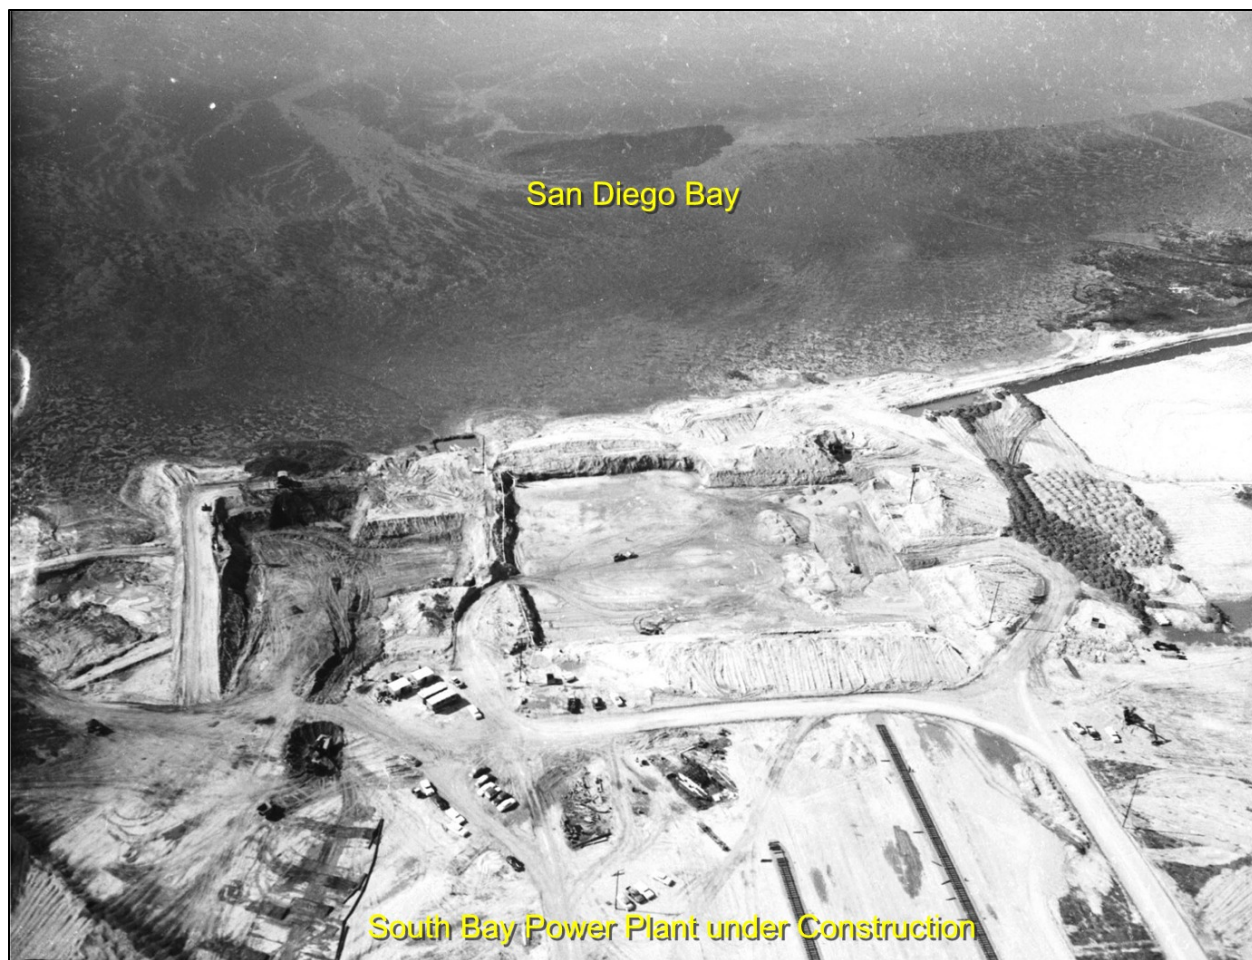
The South Bay Power Plant under construction on February 28, 1958 (view to west)
